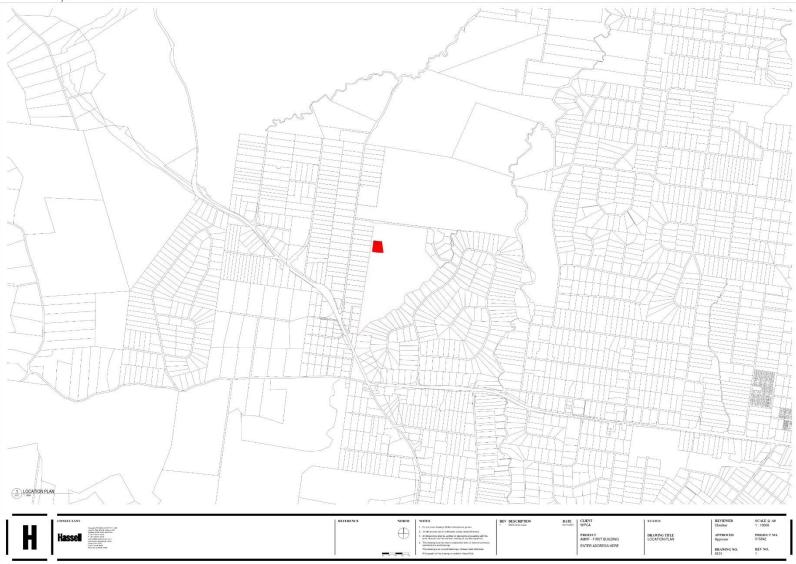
AMRF – First Building location plan (Architectural drawings prepared by Hassell, 2021).
